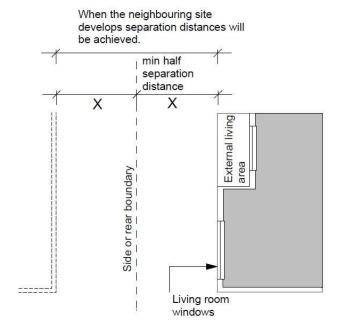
Plan - Side and rear boundary setbacks to prevent overlooking
